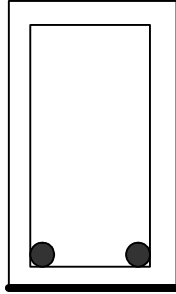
Carbon fiber wrapped beam cross section (1 longitudinal layer)
